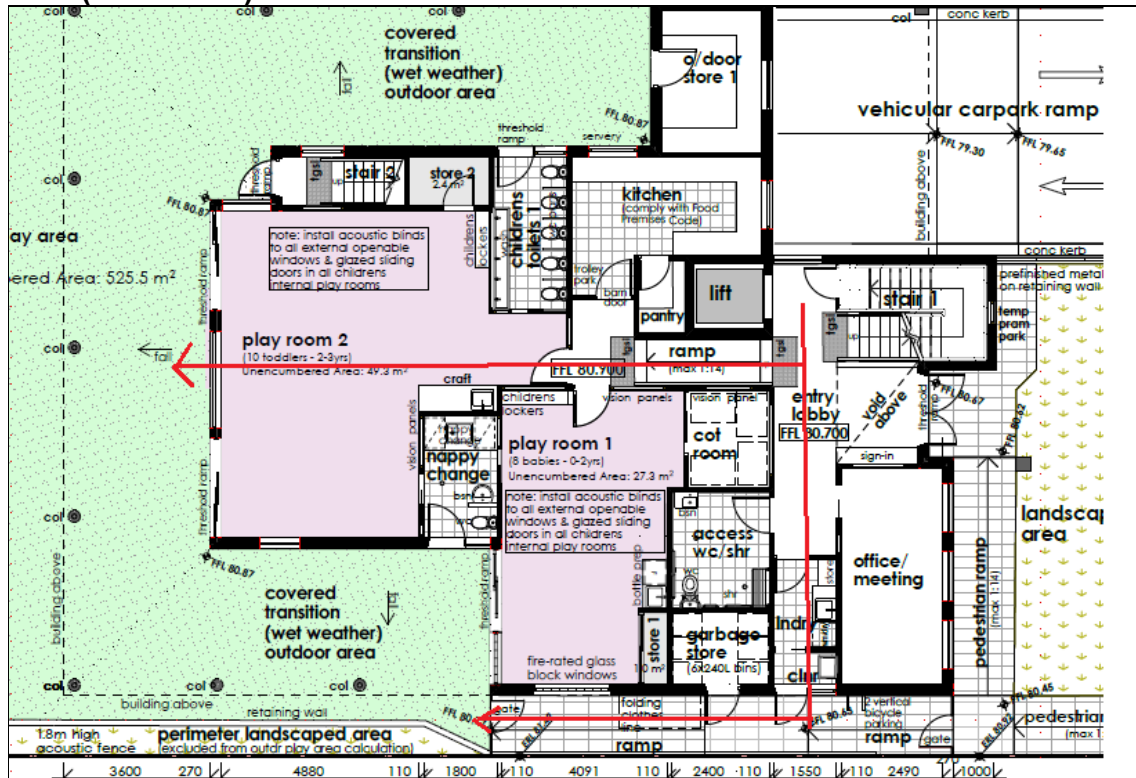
Exit points for the 50 children at first floor to access the outdoor play space
